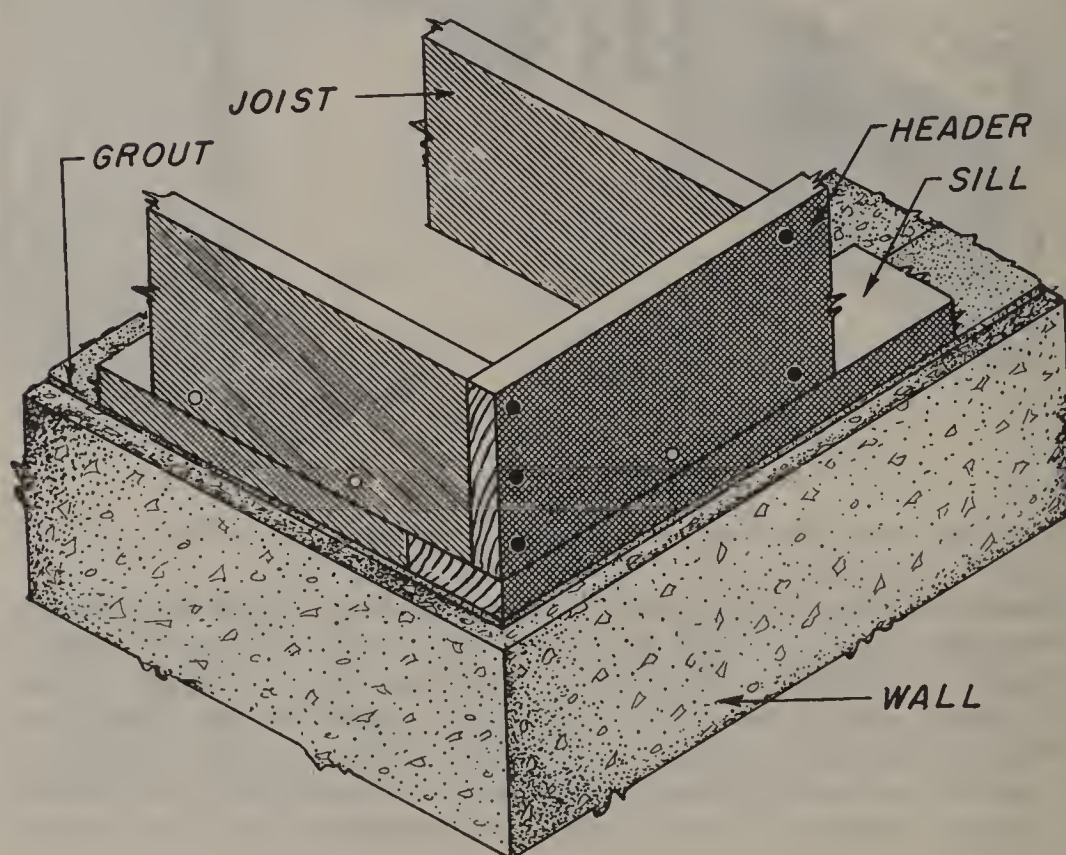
Joist. Header joist nailed to other joists with twentypenny nails, three to end joist and two to others. End and header joist toenailed to sill with tenpenny nails 16 inches on centers. Note: If diagonal sheathing or plywood sheathing is used and is nailed as shown in figure 32 or figure 34, toenailing to sill is unnecessary except to hold joist in position during construction.
